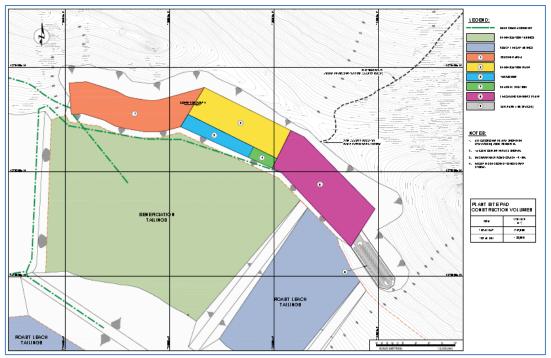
WASTE DUMP AND TAILINGS LOCATION PLAN.
